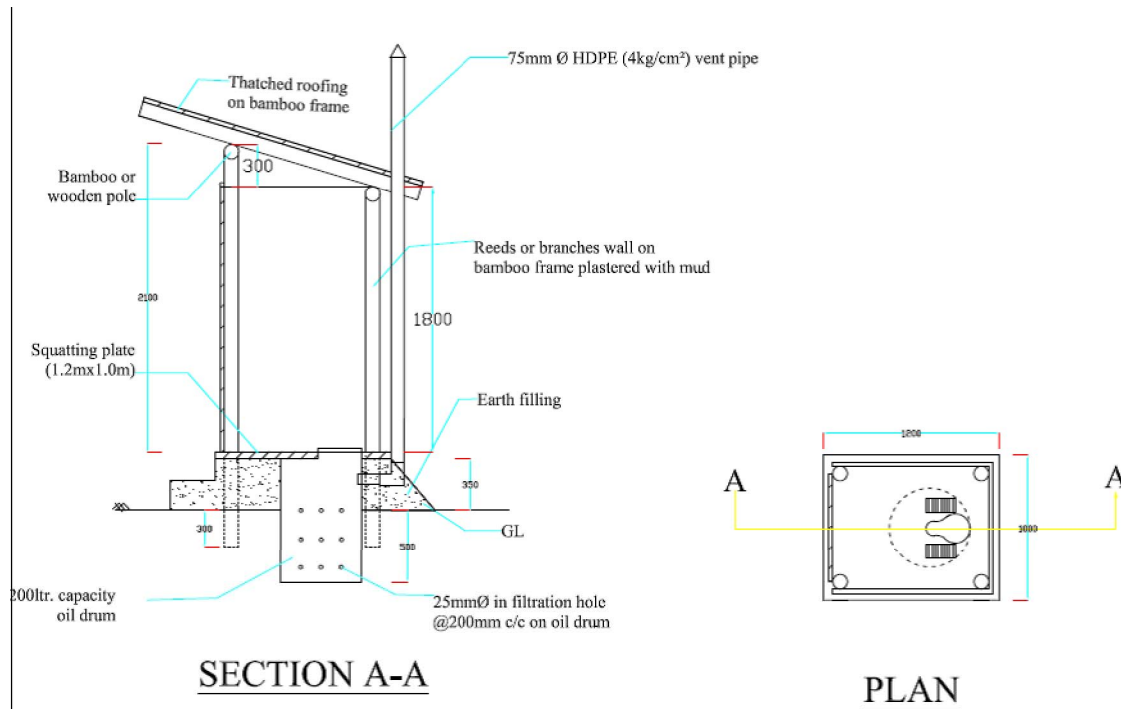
Emergency Toilet Type A and plan (source: DWSS)
